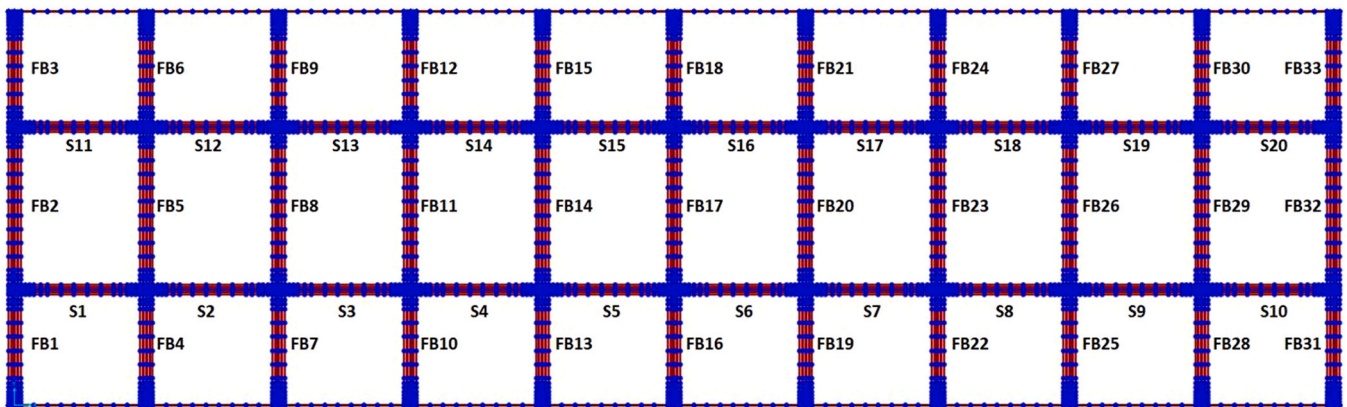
Nomenclature of stringers and floor beams position in the bridge floor system.
